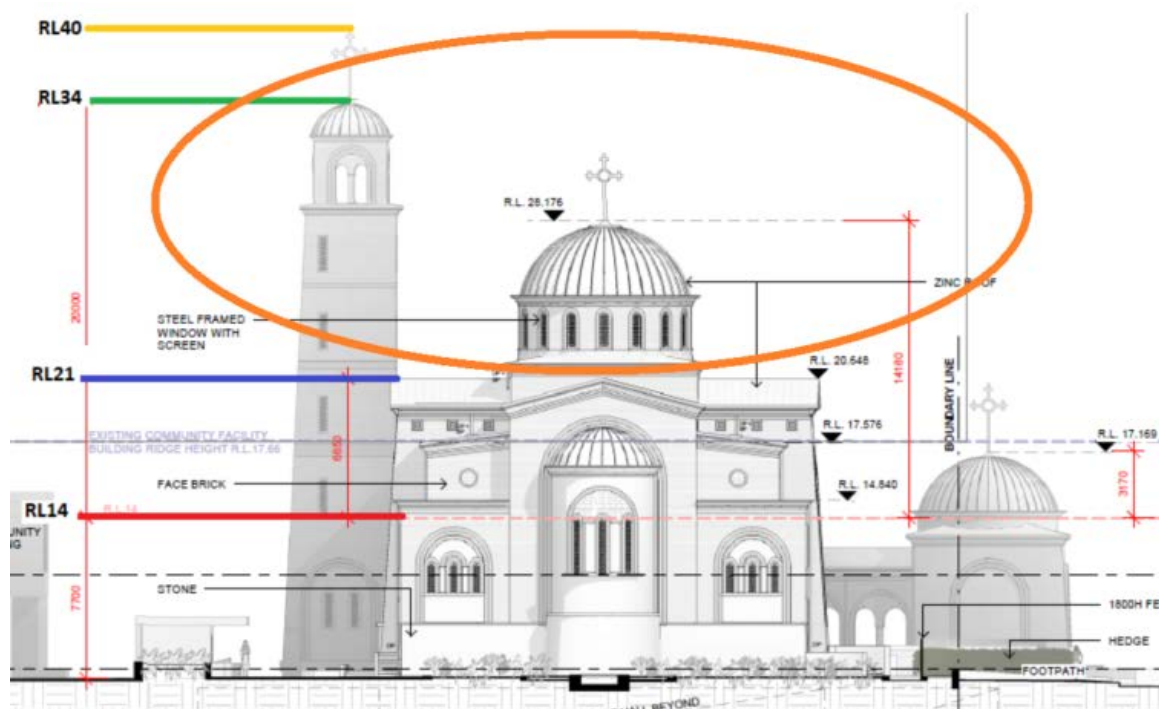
Area between RL21 to RL40 where architectural roof features could occur as currently drafted (Source: Development application plans)
